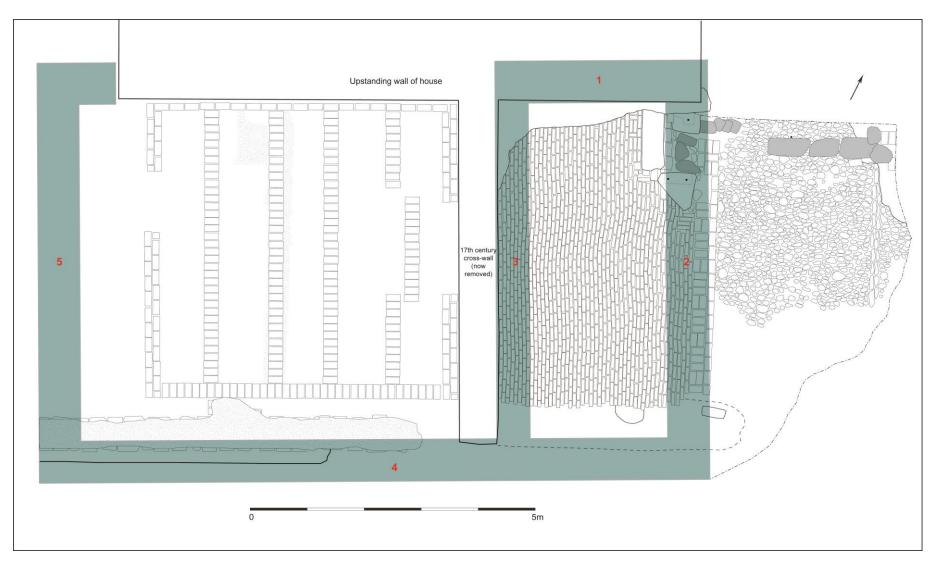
Plan of foundations for new extension overlying earlier structural remains. Features lying within new foundation limits (marked in green) have since been removed. The cross wall was also removed (prior to excavation of the foundations). Foundation cuttings numbered 1-5 according to discussion given in Section 6.4
